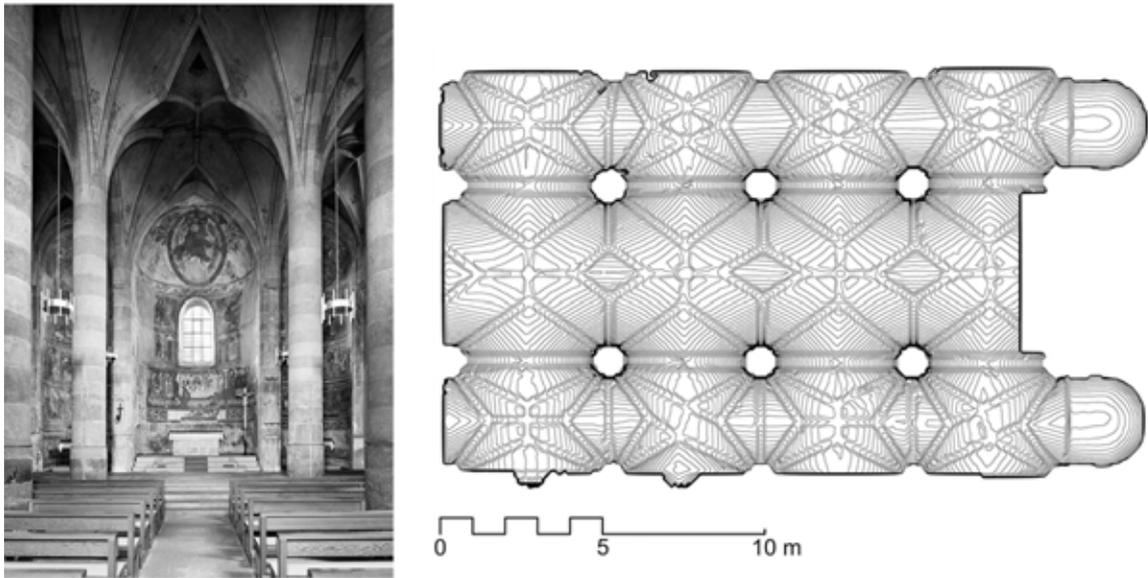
Interior of the Convent Church of St. John in Müstair and elevation plan with intervals of 10 cm (Photo: Foundation 'Stiftung Pro Kloster St. Johann' / Plan: M. Maissen)
